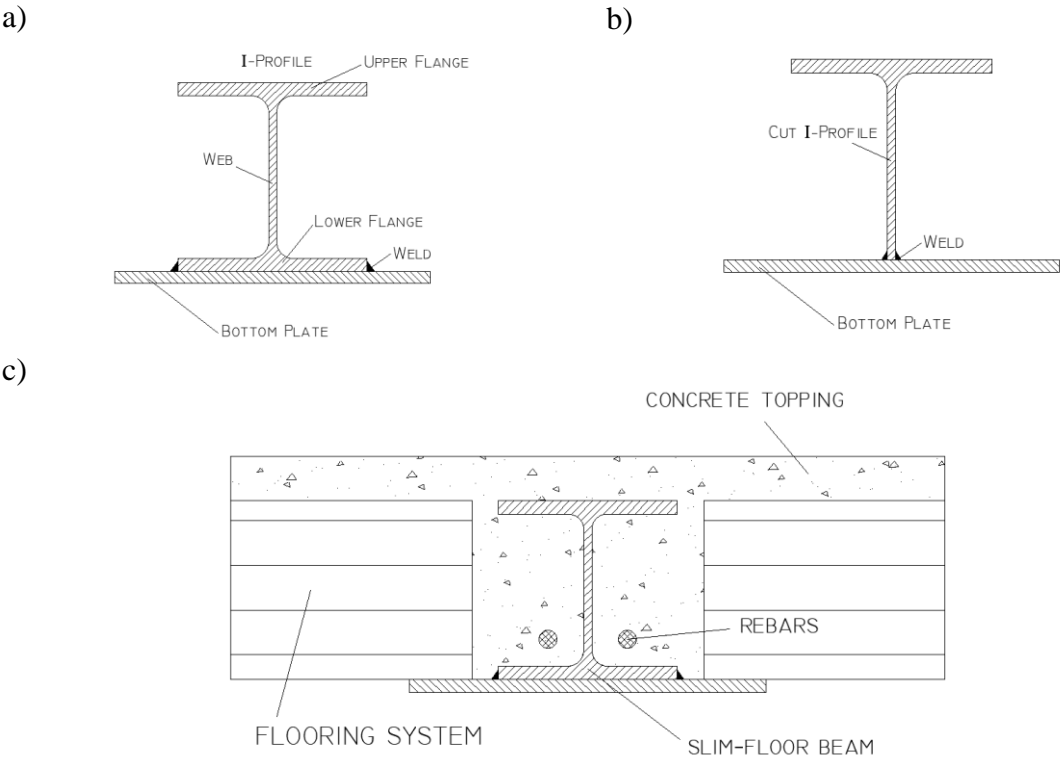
a) Shallow Floor Beam (SFB). b) Integrated Floor Beam (IFB). c) Slim-floor system
